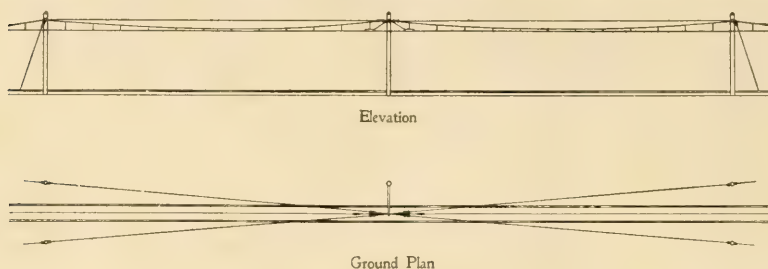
GENERAL ARRANGEMENT OF ANCHOR WIRES
